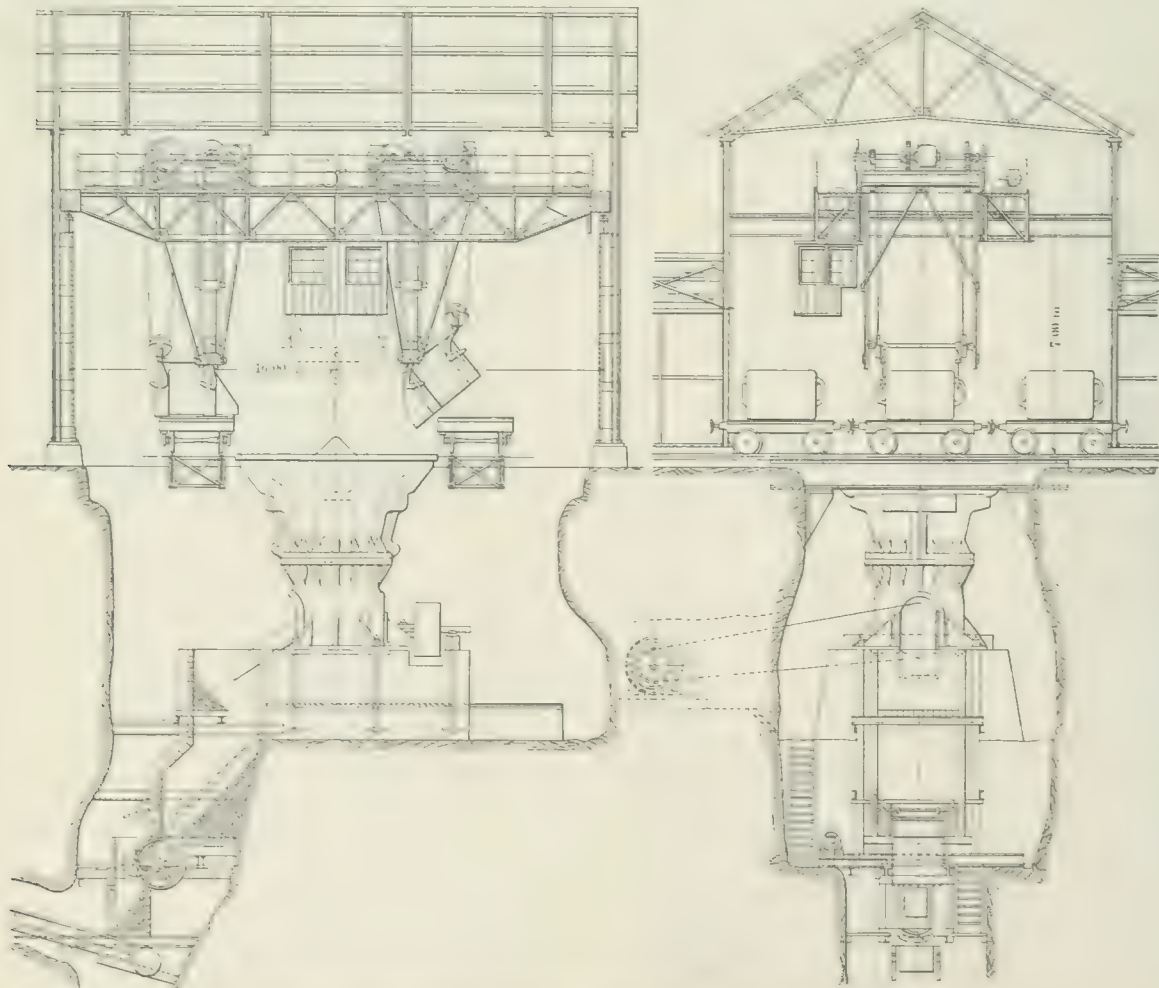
End and Side Elevations, Showing General Arrangement of Crushing Plant.
